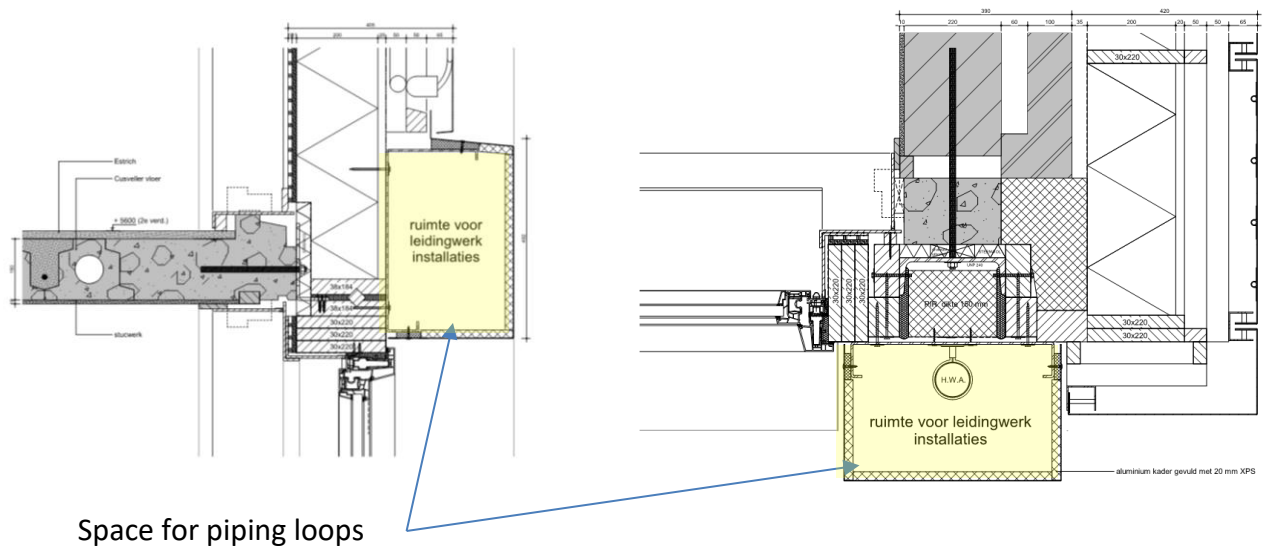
Deep renovation of row houses with ribbon windows. Vertical detail of the anchorage to the floor slab (on the left) and horizontal detail of the facade corner (on the right) (BAM project)
